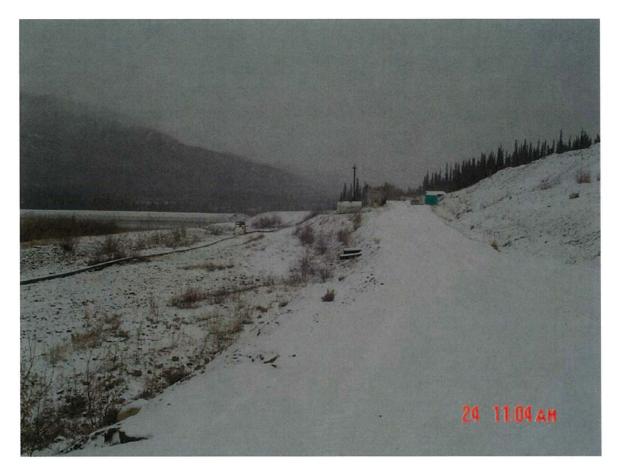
Intermediate Dam Spillway channel, looking downstream.
